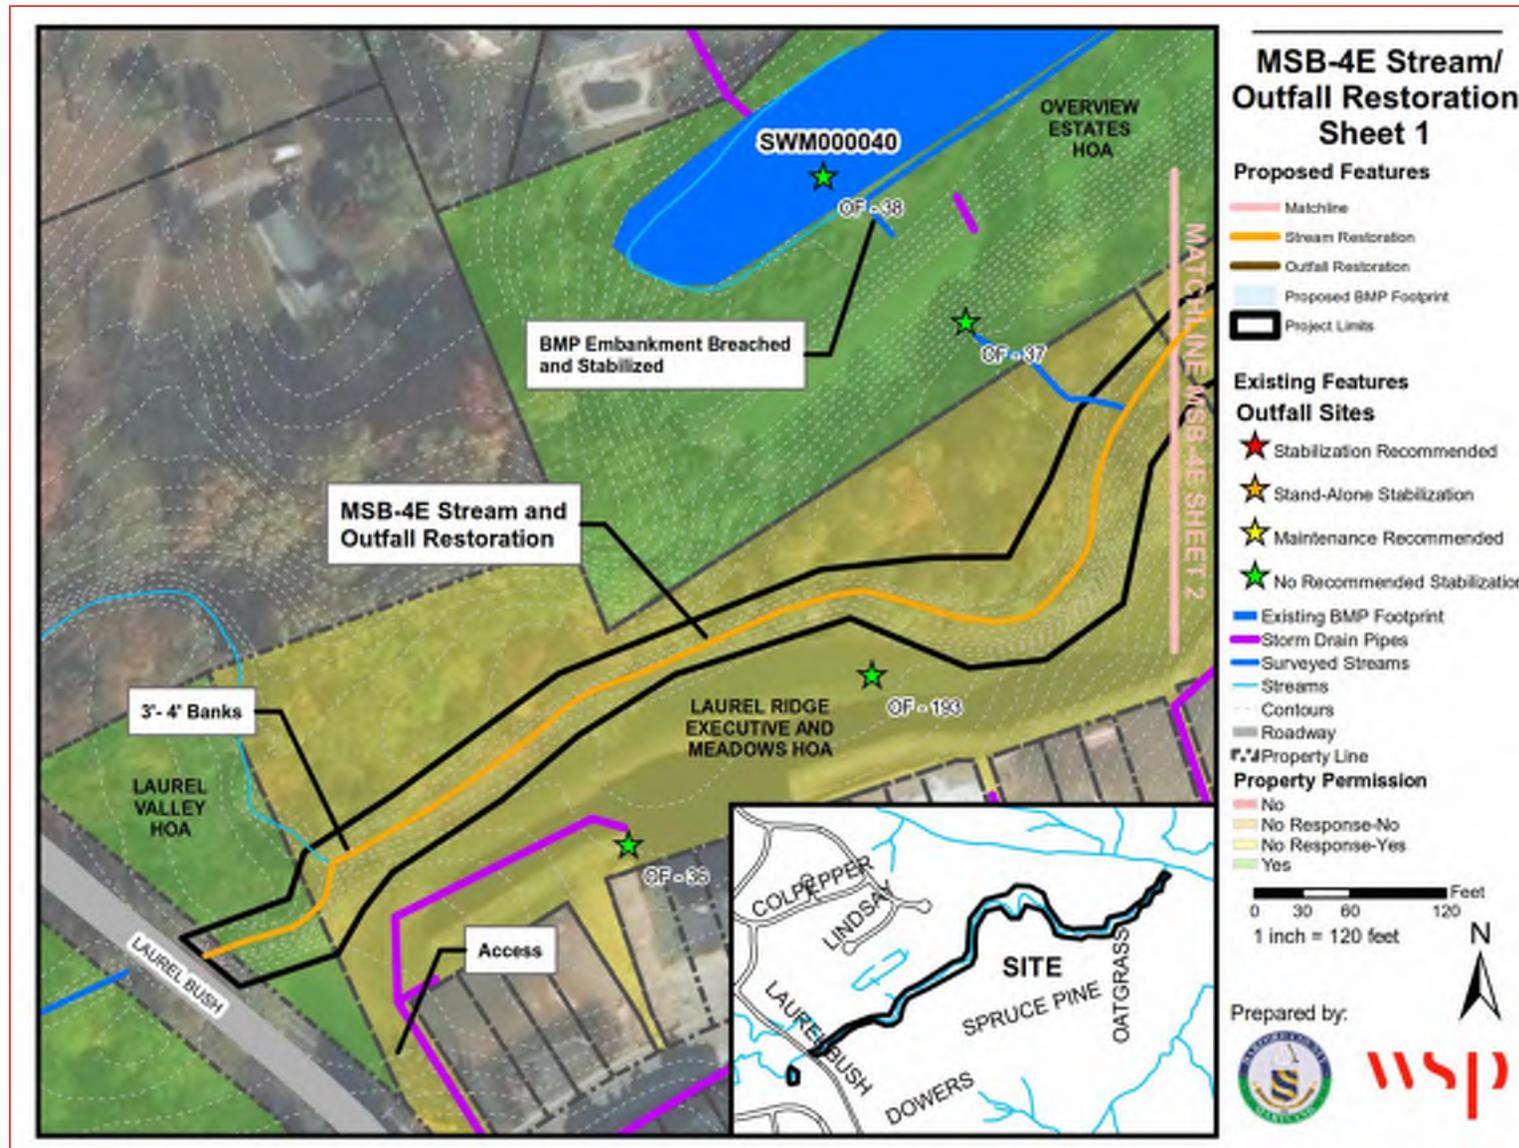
Site Location and Proposed Project Plan for MSB-4E Stream and Outfall Restoration (Sheet 1 of 5)
